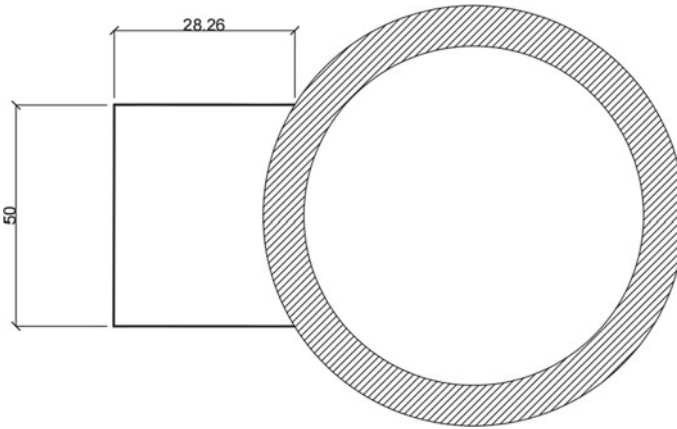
The shape of truss section reinforcement (in mm) [12]
